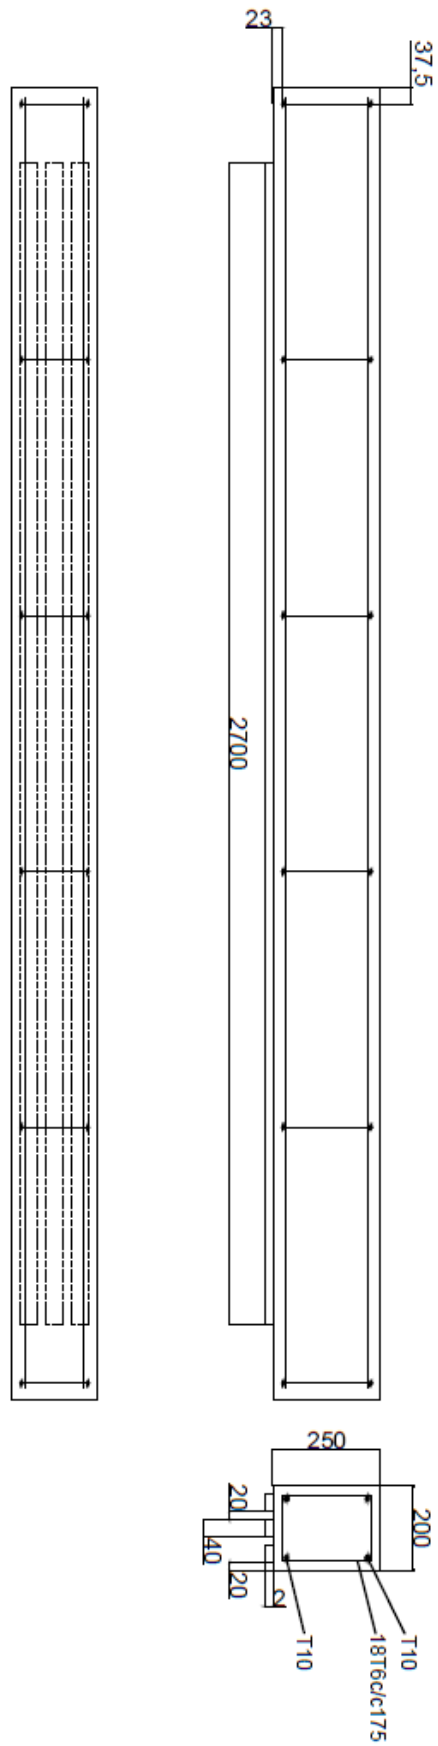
Steel plates application, partially reinforced beam, general drawings.
